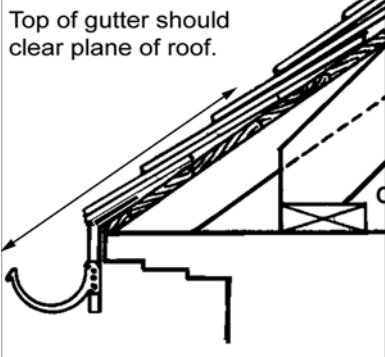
Ideally, the outer edge of external rain gutters should be hung below the plane of the roof to prevent damage to the gutters from sliding ice and snow.
